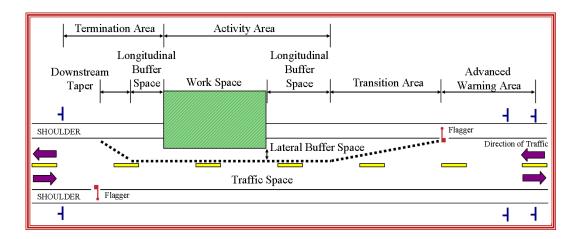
Typical work zone layout (Savolainen, Apr-2016)
